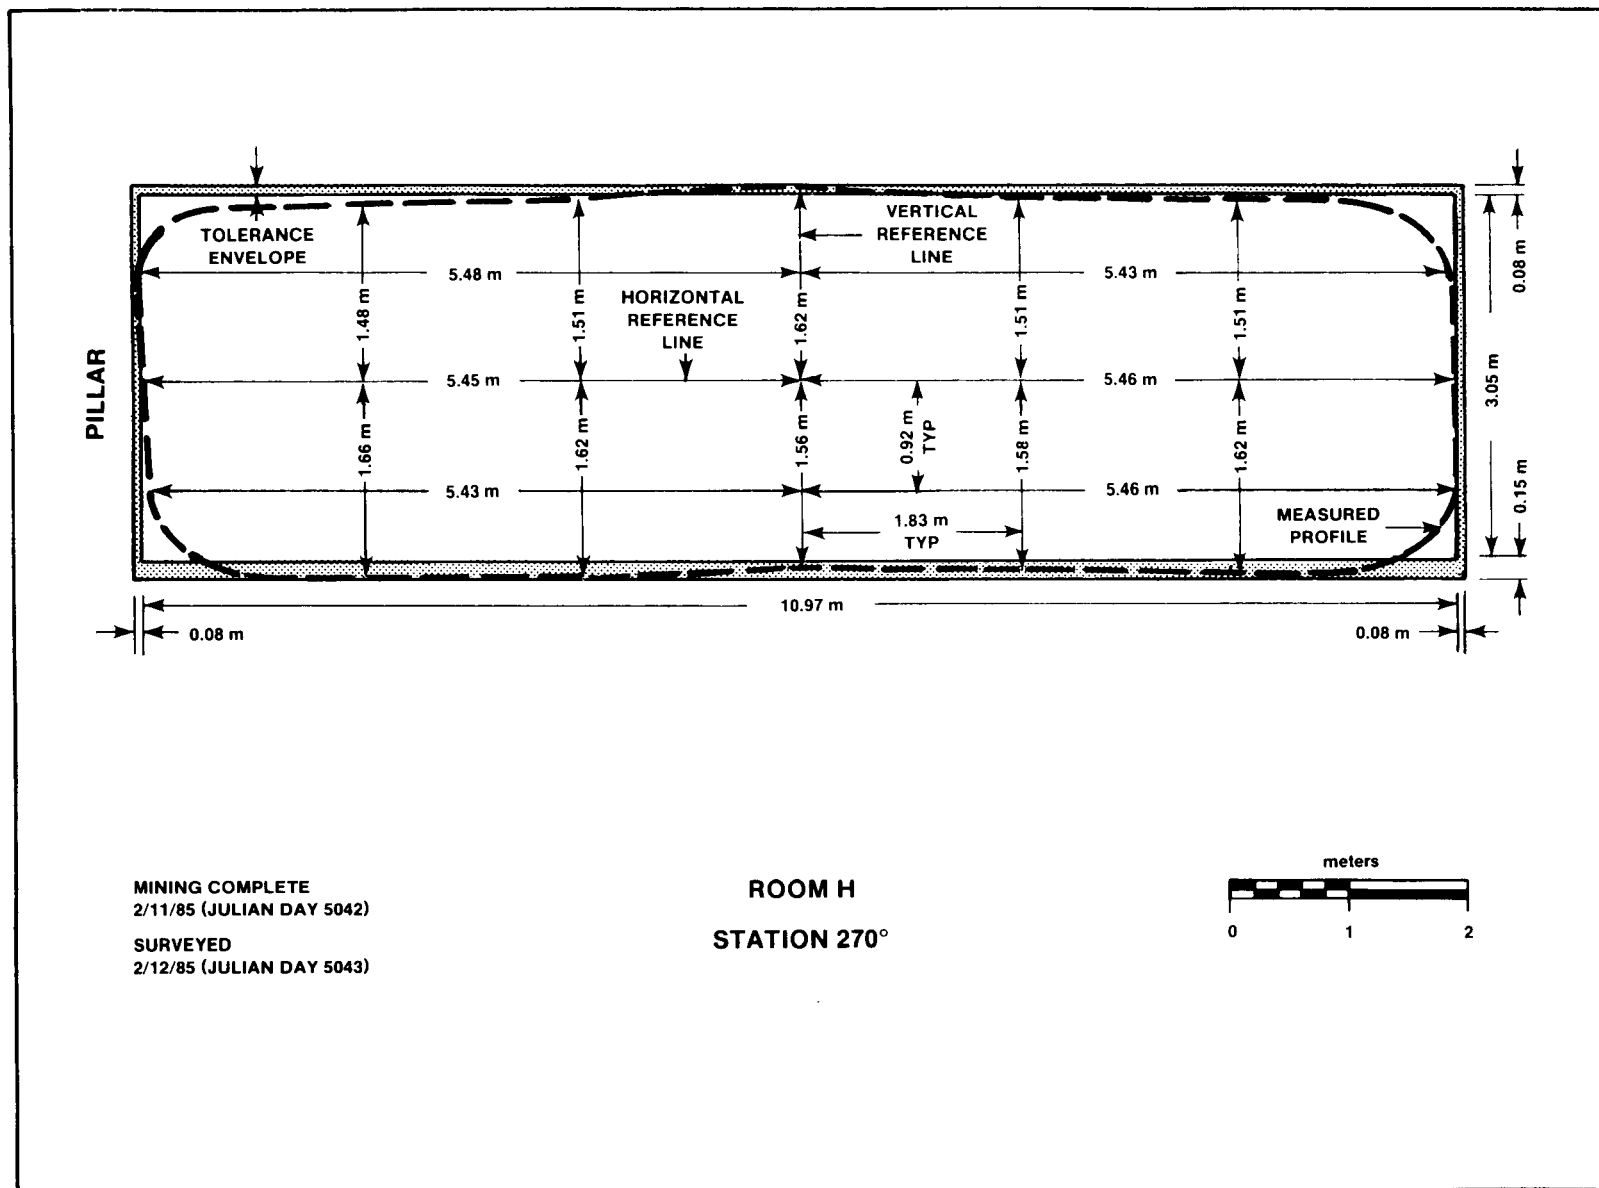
Typical "As-Built" Cross Section of Room H, 270° Station
